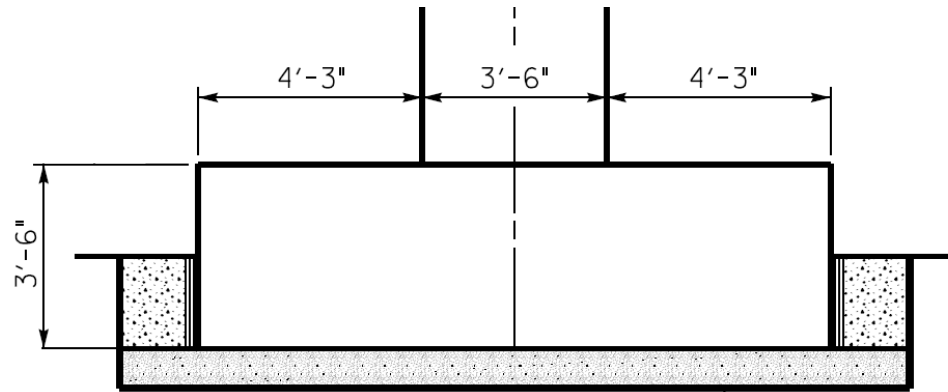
Pier 3 (prior to placement of superstructure).
